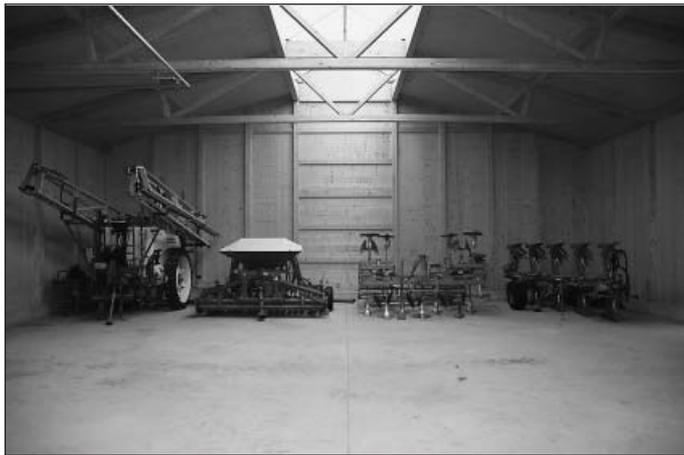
Three-ply panels with laminated timber frame ribbing are basic elements brought together in the construction of Johann Kinzner's machinery barn.
